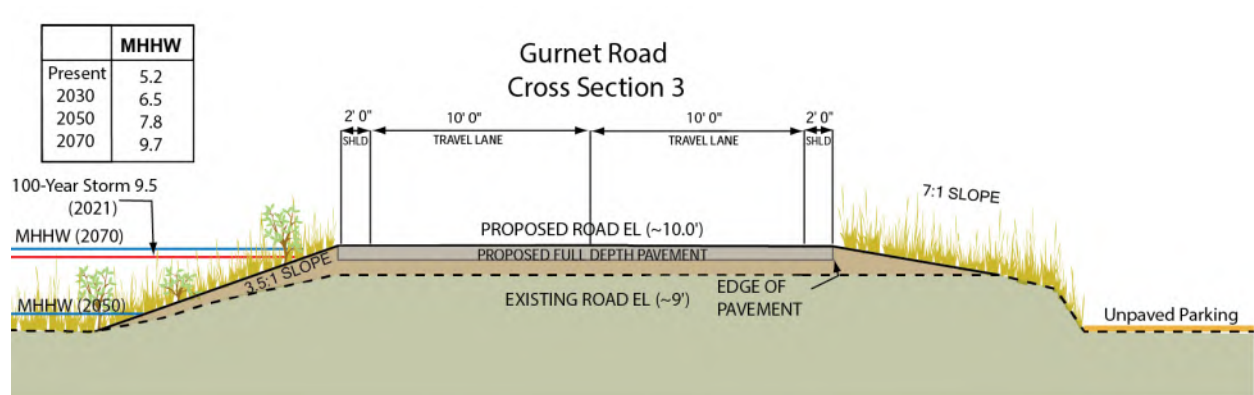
Gurnet Road adaptation plan at Cross Section 3
